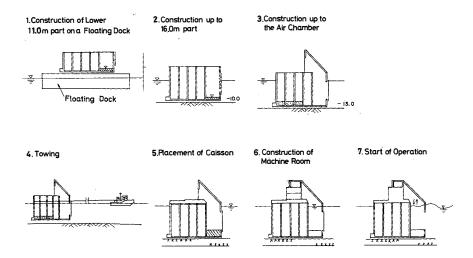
Construction procedure for wave power extracting caisson breakwater.
